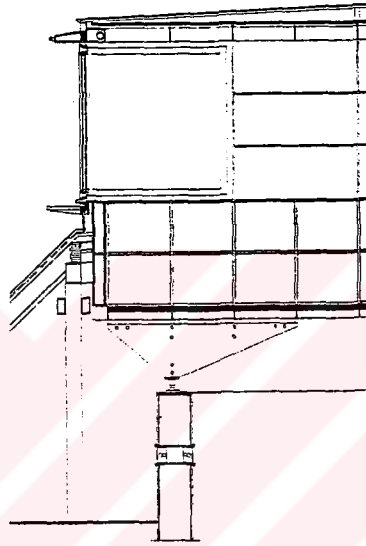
Partial section through roof terrace. The steel supports rest on the walls of the hall on the floor below.
